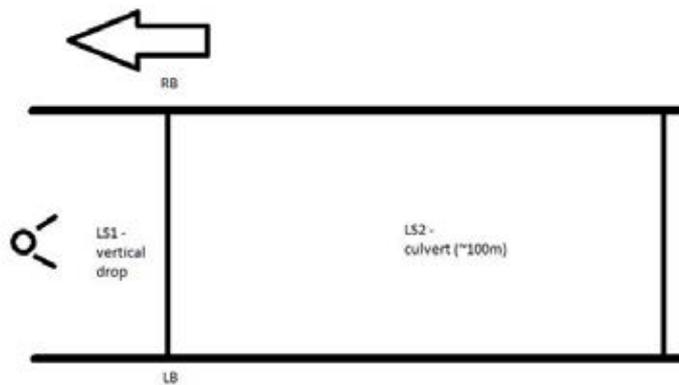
Site plan of Gutteridge Woods Culvert
